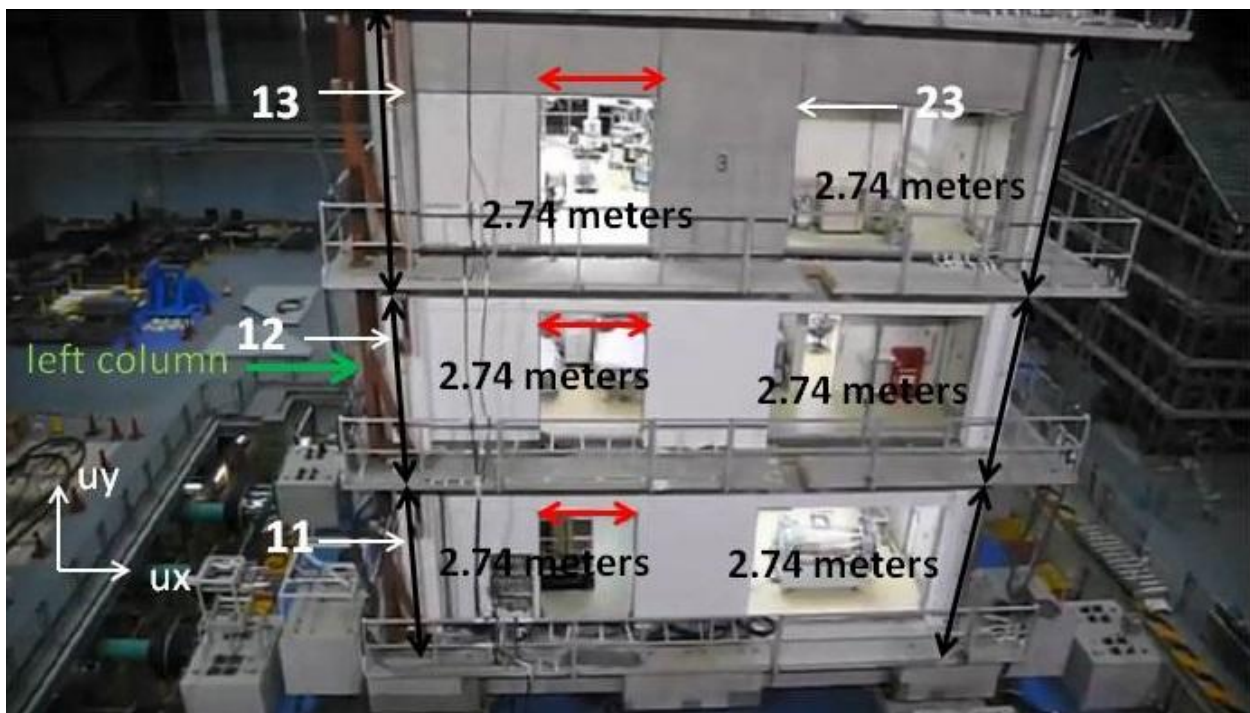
View of the building. The targets are in white. The black bars are the floors ceilings, which we assume being similar. The red bars are the widths of openings, which we assume being similar.
